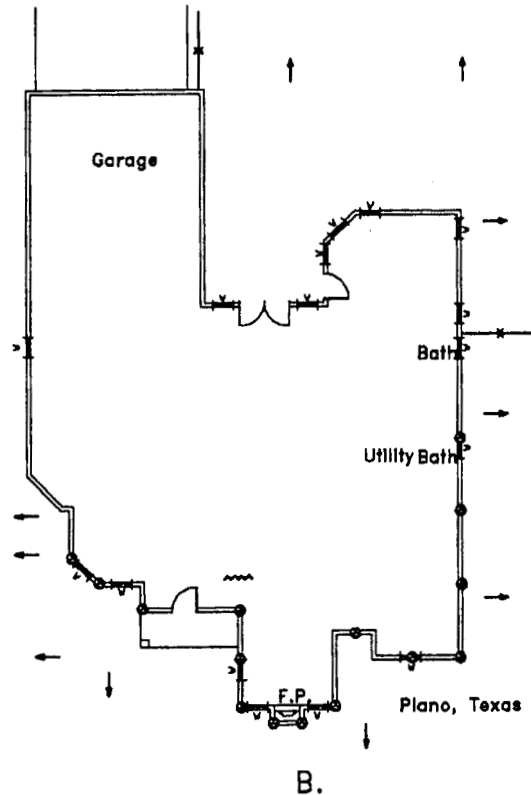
B.4.6. (continued). Raising the perimeter beam.
